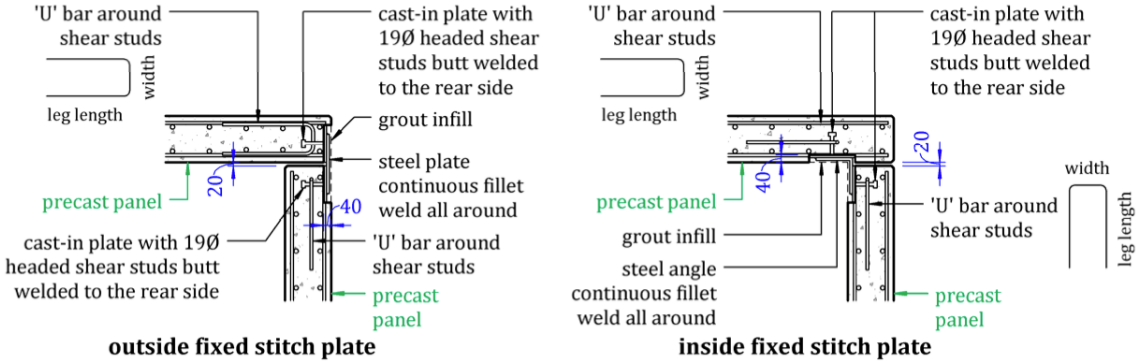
Examples of typical welded stitch plate connections in Australia (Menegon, 2018)
